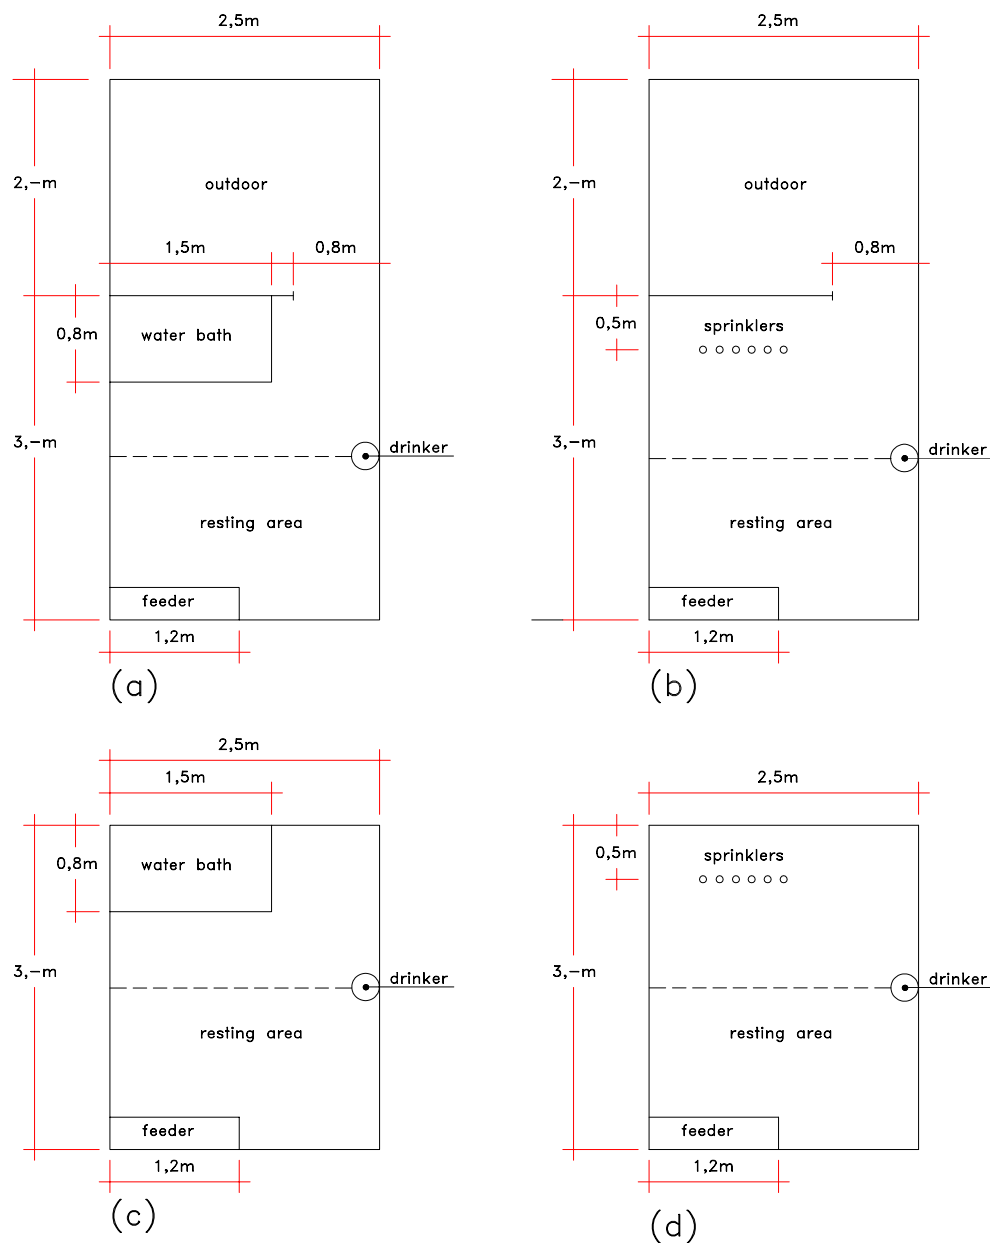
Pen layout with and without outdoor yard, and cooling system. (a) pen with outdoor yard and water bath; (b) pen with outdoor yard and sprinklers; (c) pen with water bath without outdoor yard; (d) pen with water bath without outdoor yard
